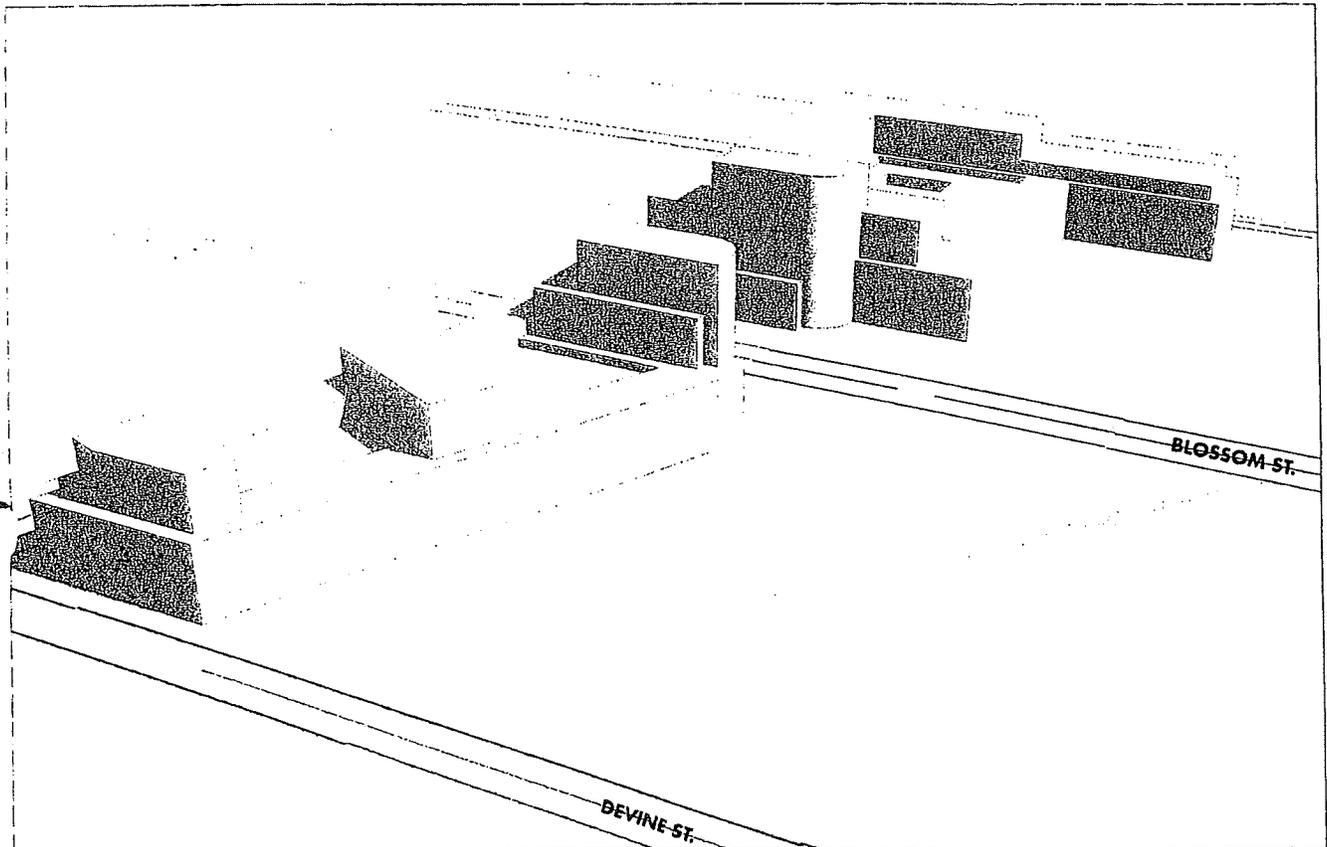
48: BLOSSOM STREET GATEWAY BUILDING MASSING ILLUSTRATIVE
